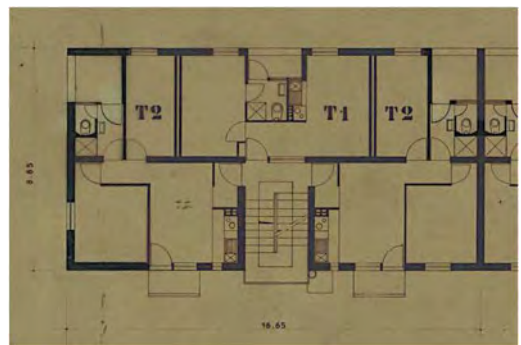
Machado Vaz*. Floor plan with vertical access. 3 dwellings per floor. 1963. Vasco Mendes et al. © Arquivo Municipal do Porto.
